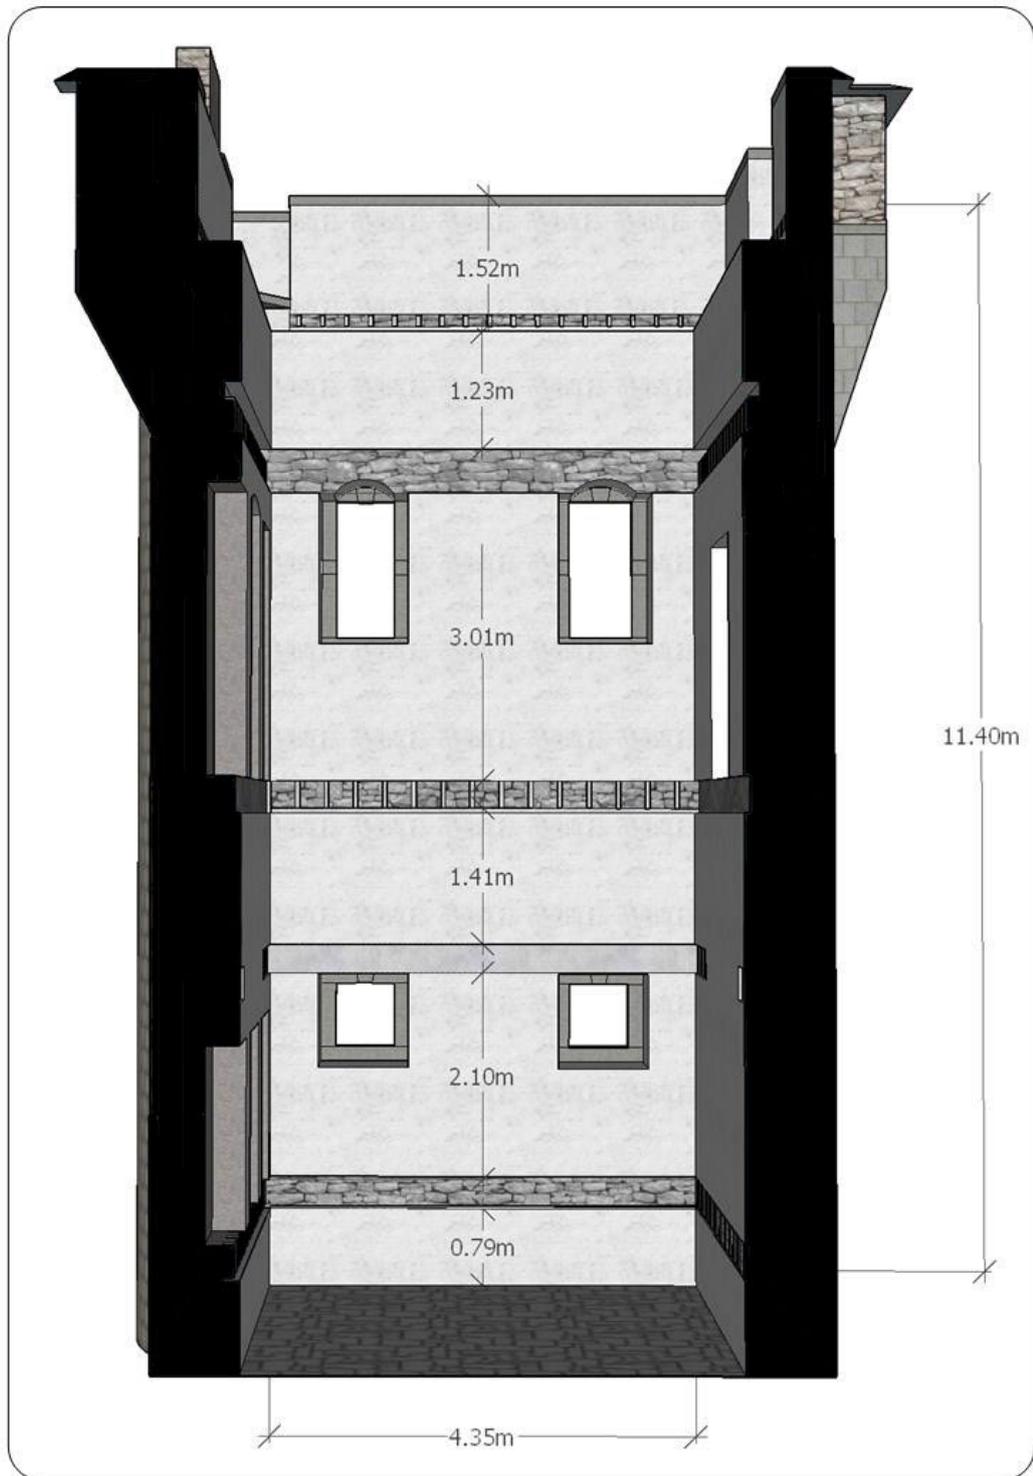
Cut away view of 3D model for an idealised tower showing interior face of side wall, windows and entry to bartizan at top left.
